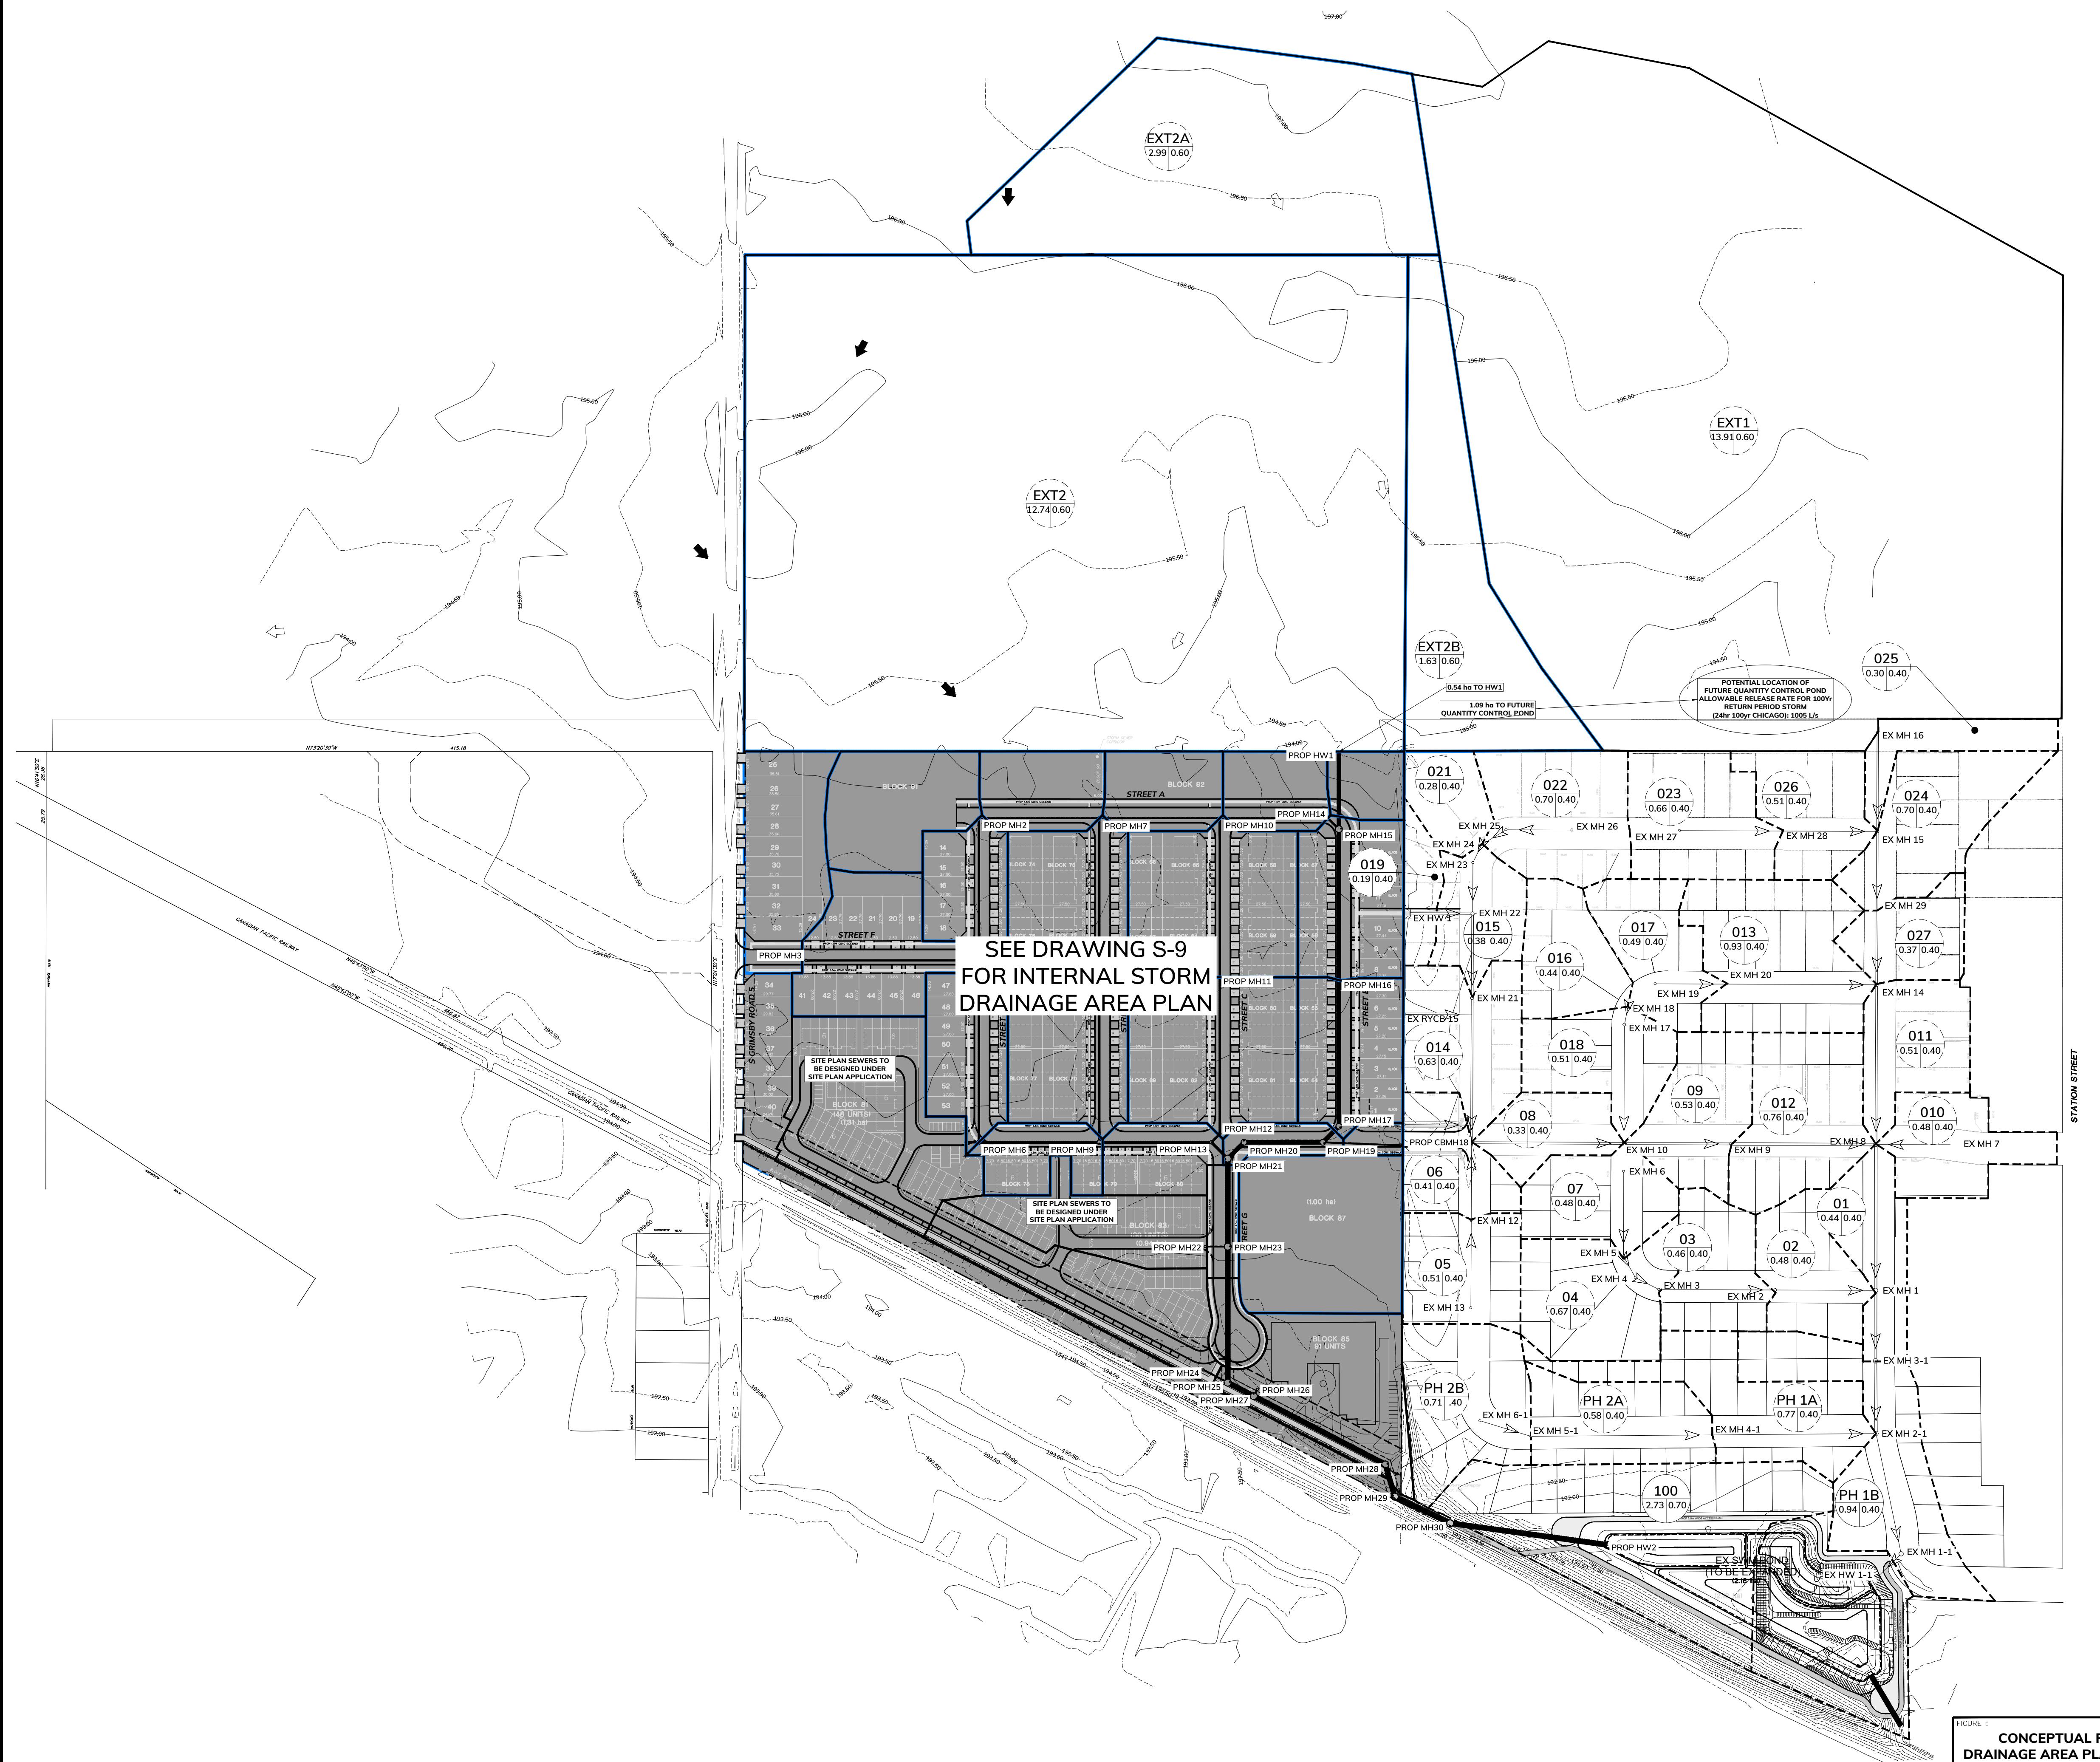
FIGURE : CONCEPTUAL POST DEVELOPMENT STORM DRAINAGE AREA PLAN (INCLUDING EXTERNAL AREA)
